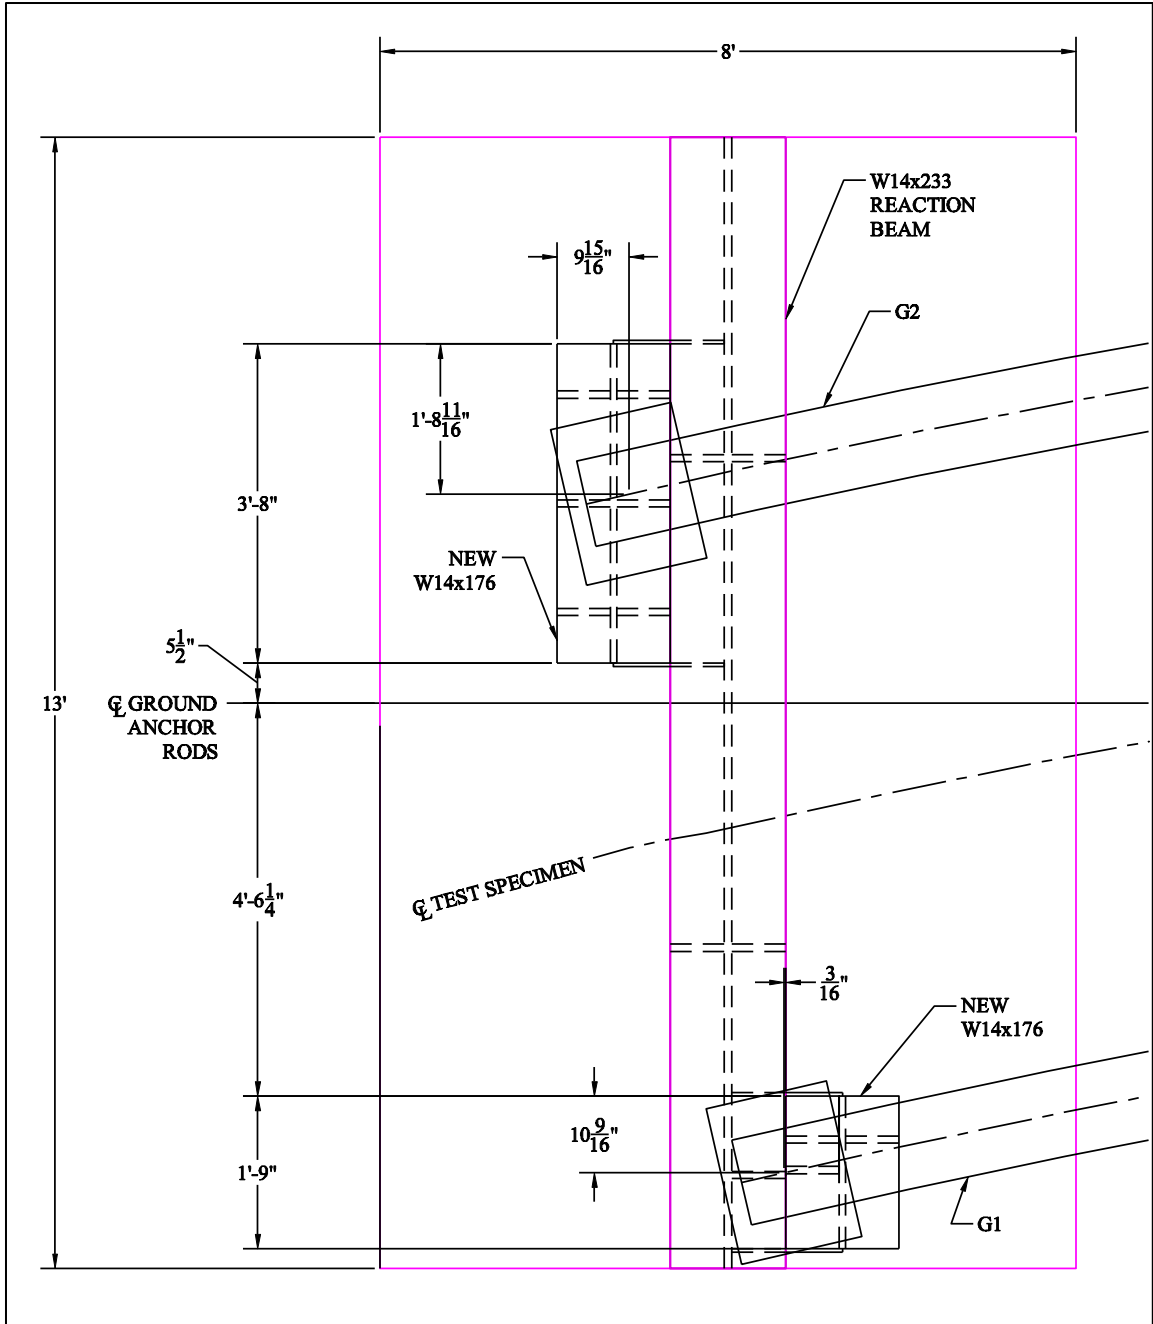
Plan view of west bearing and footing (Putnam, 2011)
